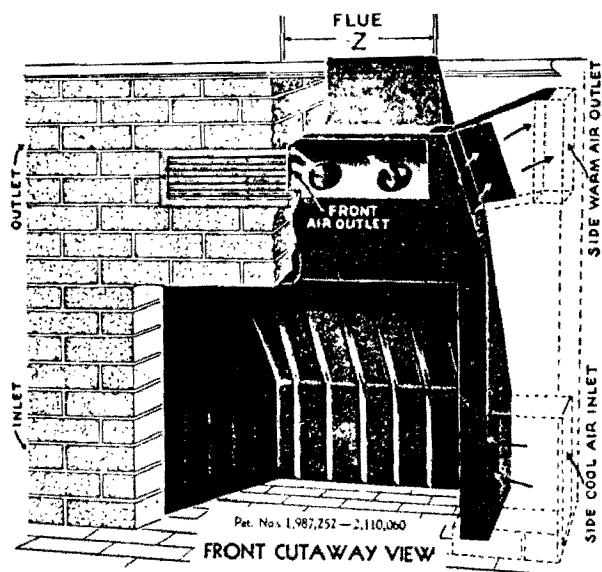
CIRCULATING FIREPLACE CONSTRUCTION
